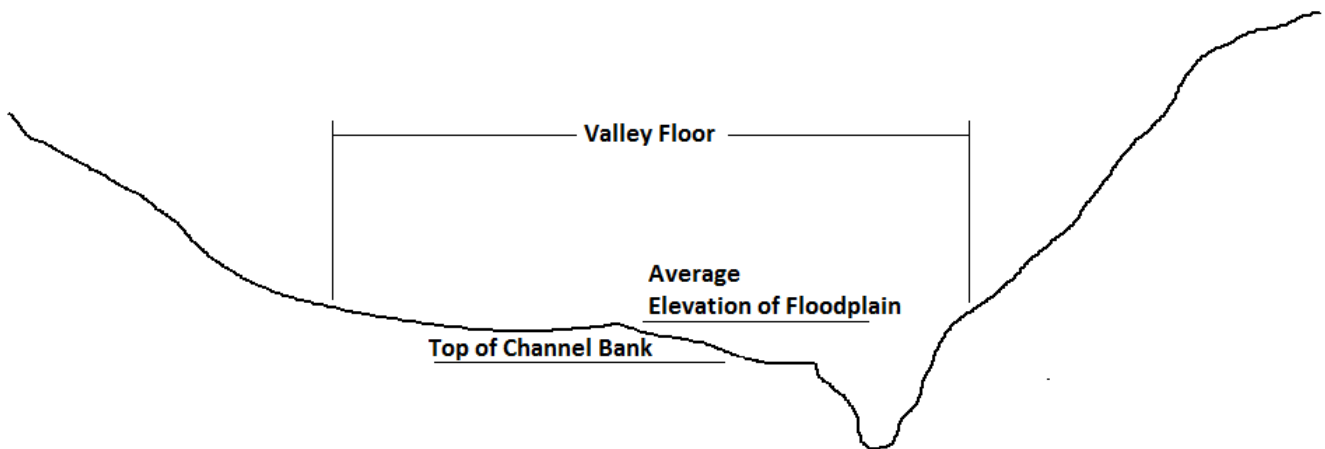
Typical Valley Cross Section at Downstream Toe of Dam.
